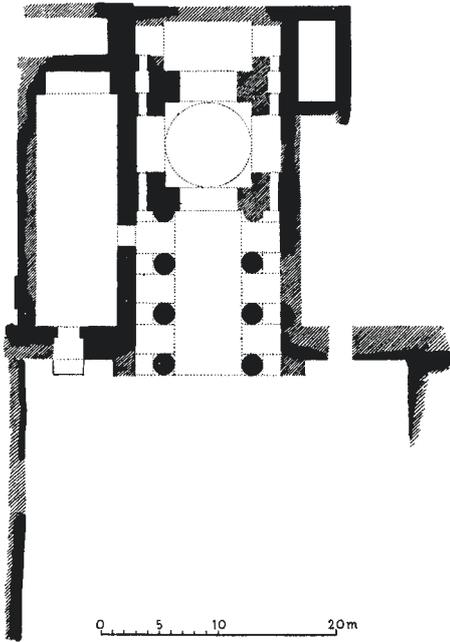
Dāmghān, columnar hall with domed room, ground plan. – (After Kimball, Dāmghān fig. 166).
